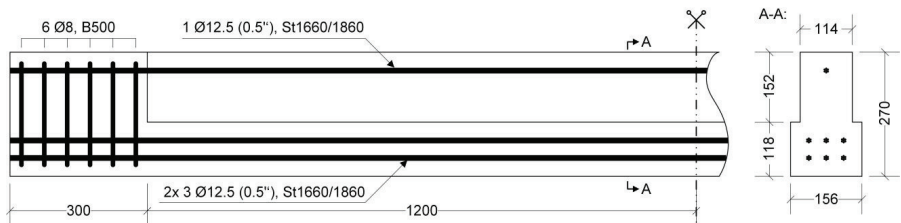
Specimen's geometry and arrangement of reinforcement and prestressing tendons.
